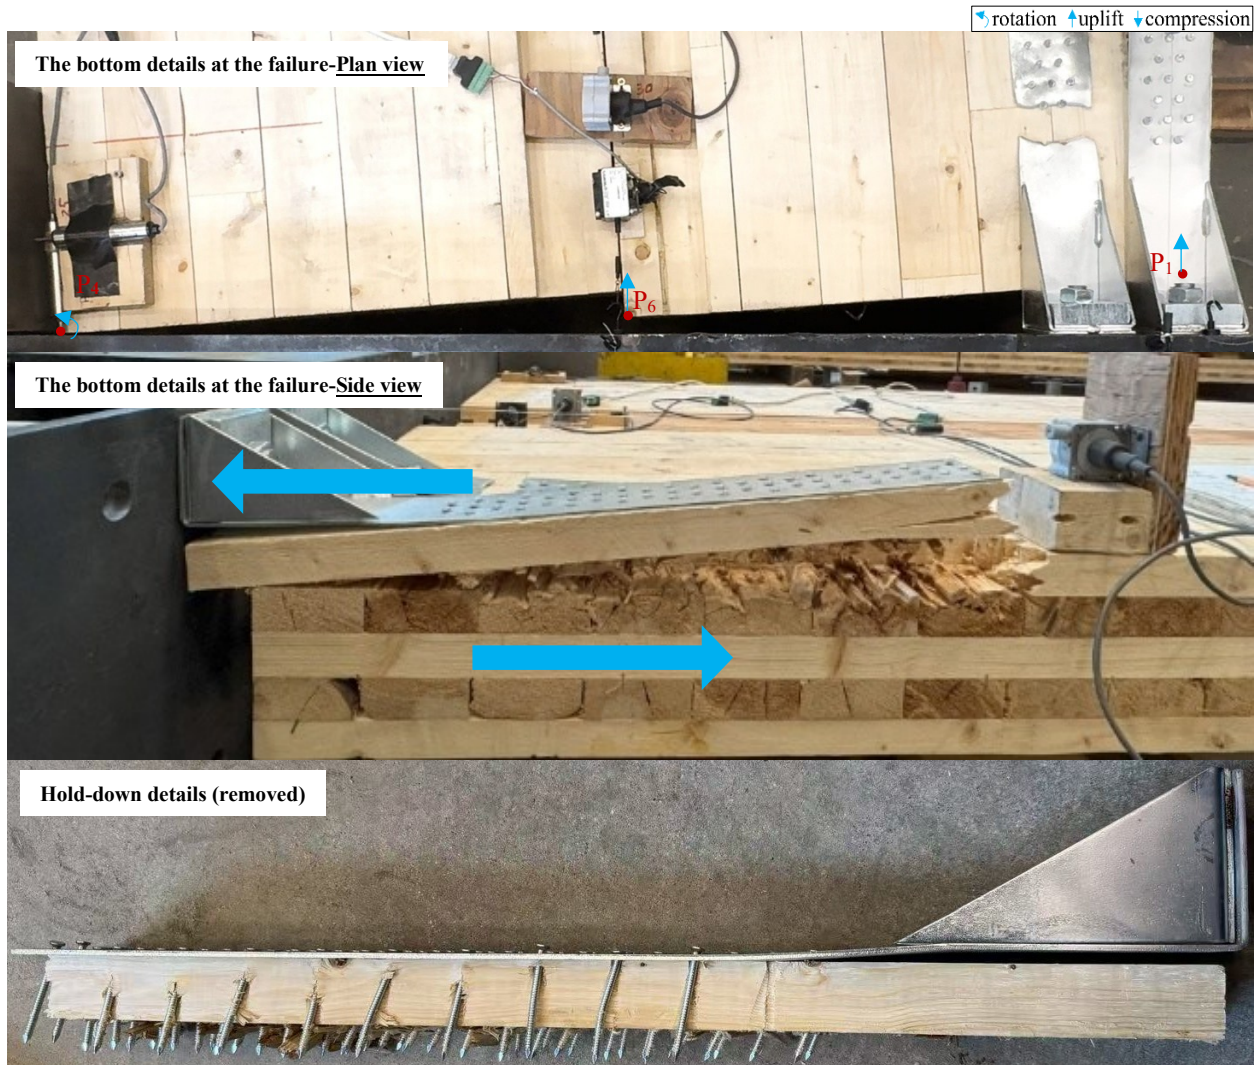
Failure mode and details of specimen W0.6-P2-H2V8b
